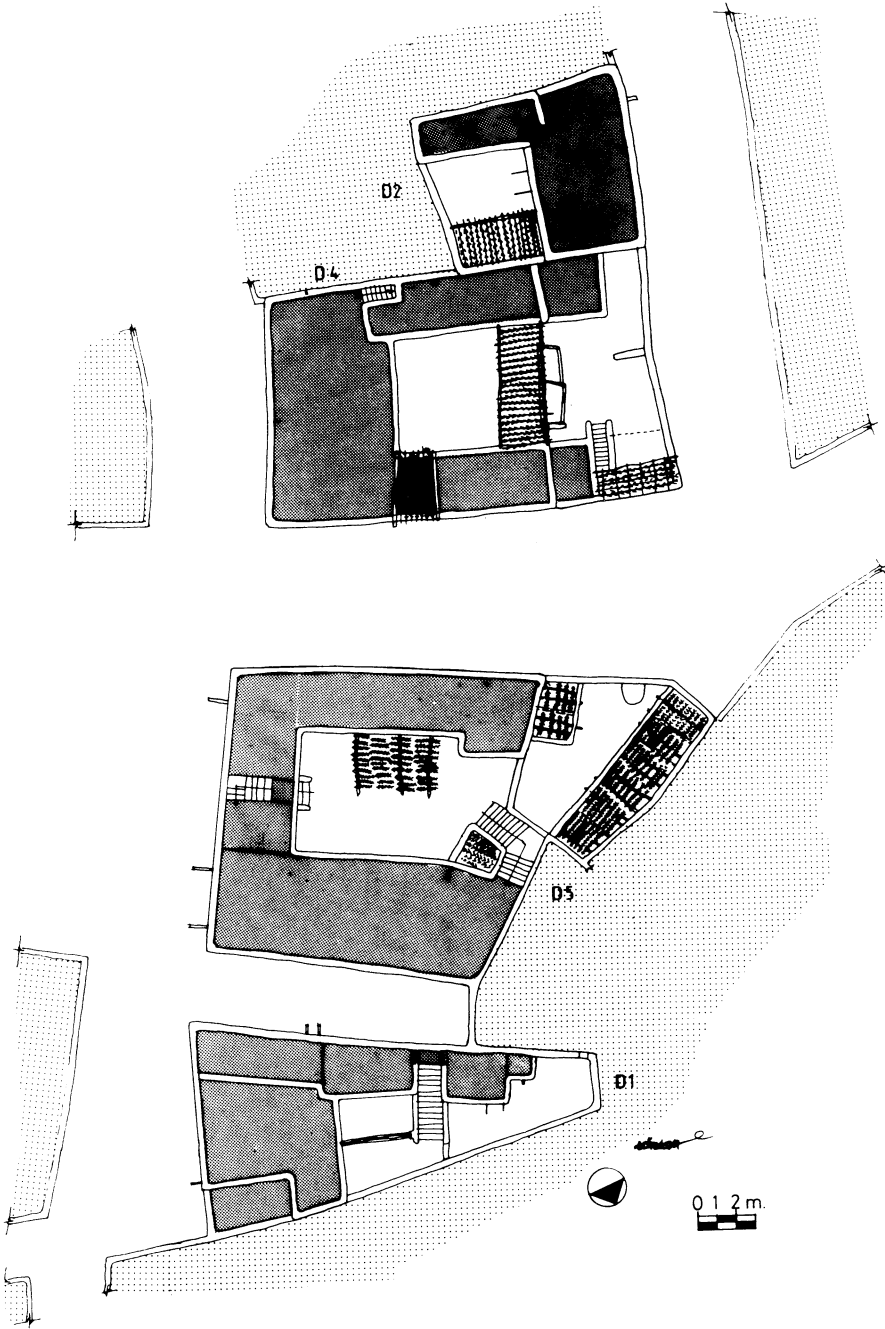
Roof plans of A cluster of houses-Diraiyah
